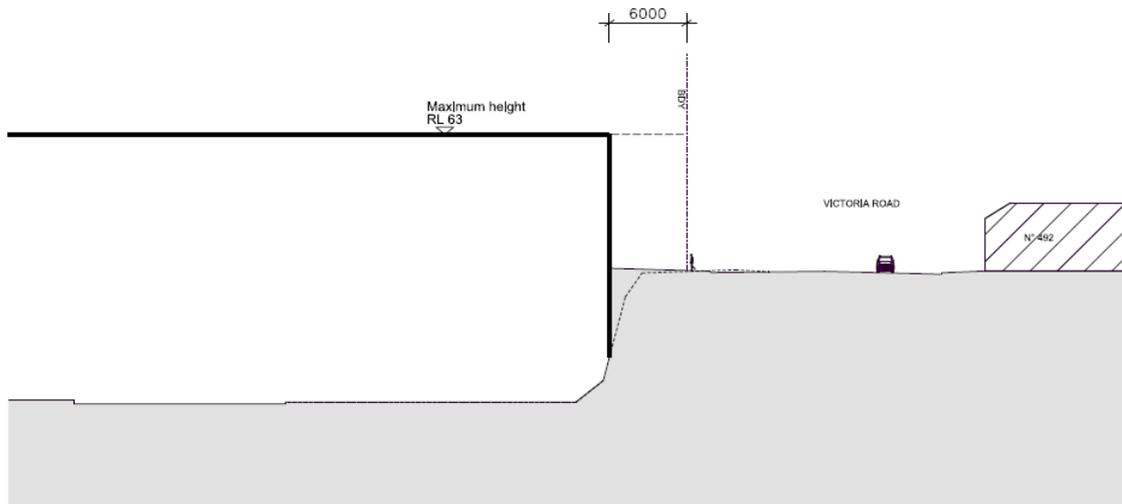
Section E Victoria Road street frontage setbacks.
